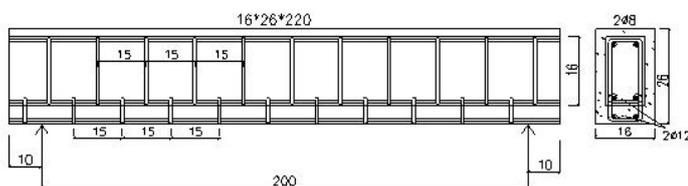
Reproduction detail of u-shaped stirrup anchoring.
